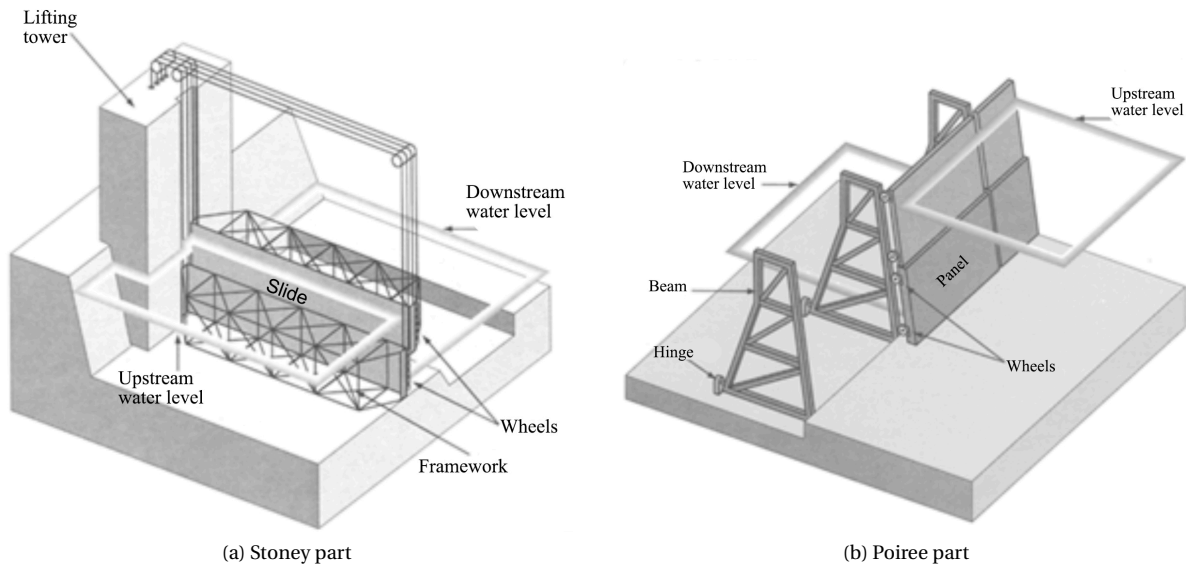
Schematisation Stoney-Poiree Weir (Schot et al., 1998)
